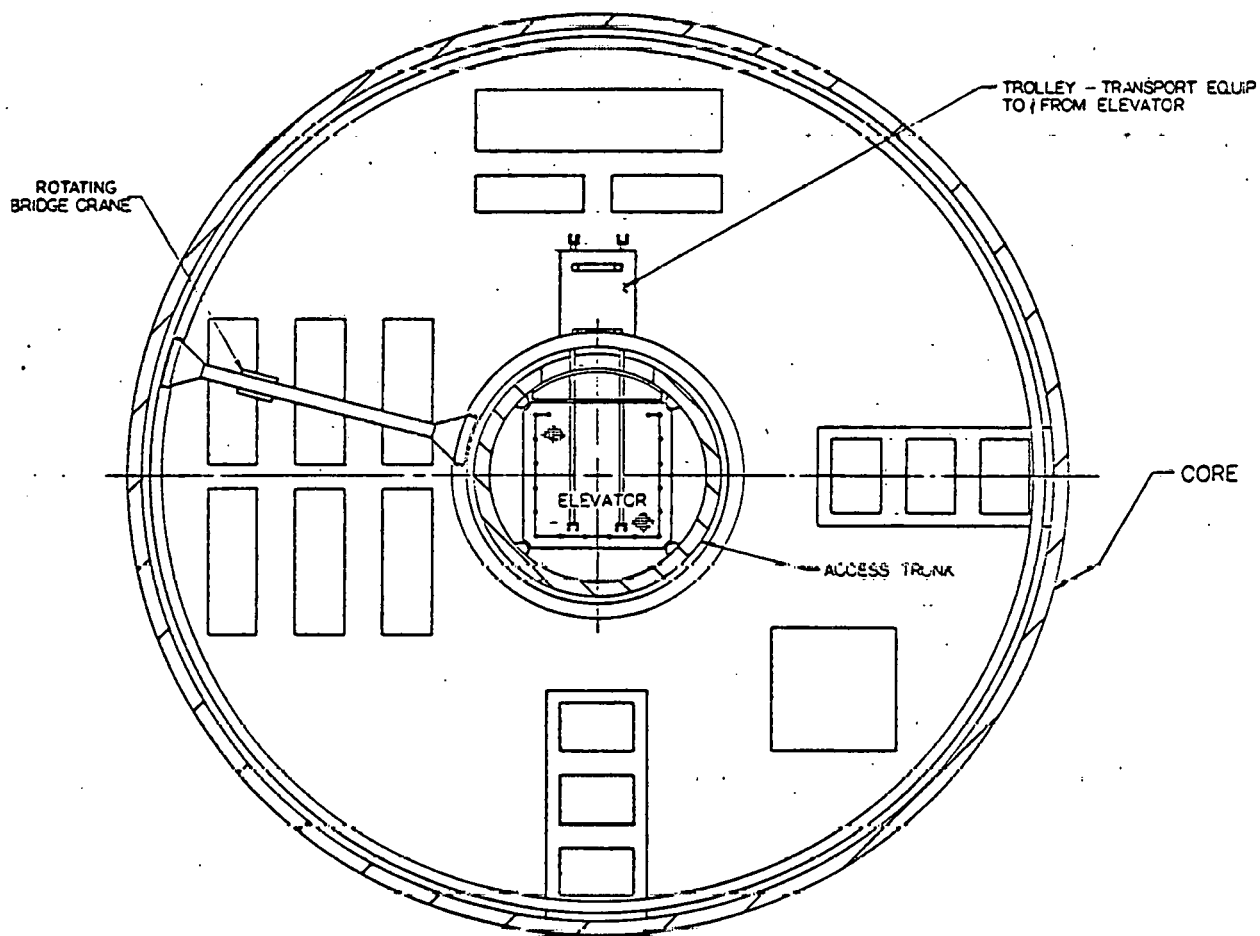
Handling Equipment Arrangement, 400-MW(e) Spar, Module Auxiliary Equipment Deck
